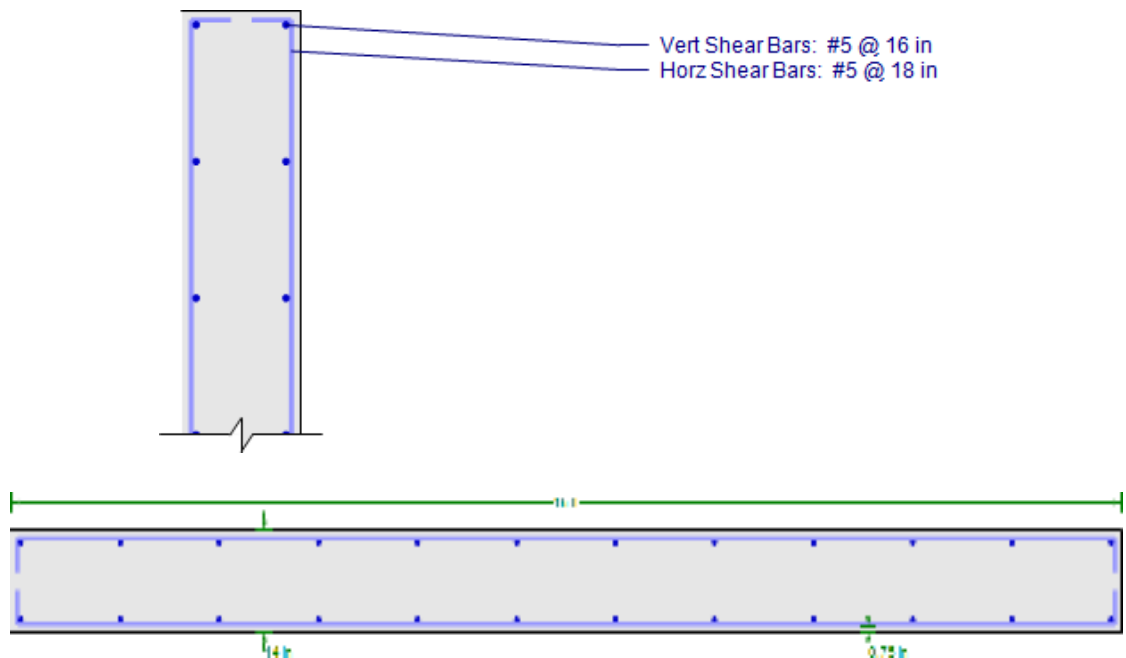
Sample Special RC Shear wall Reinforcement Details for 12-Story Buildings (B11-12S-L-S); Wall Section for Floors 4-6
